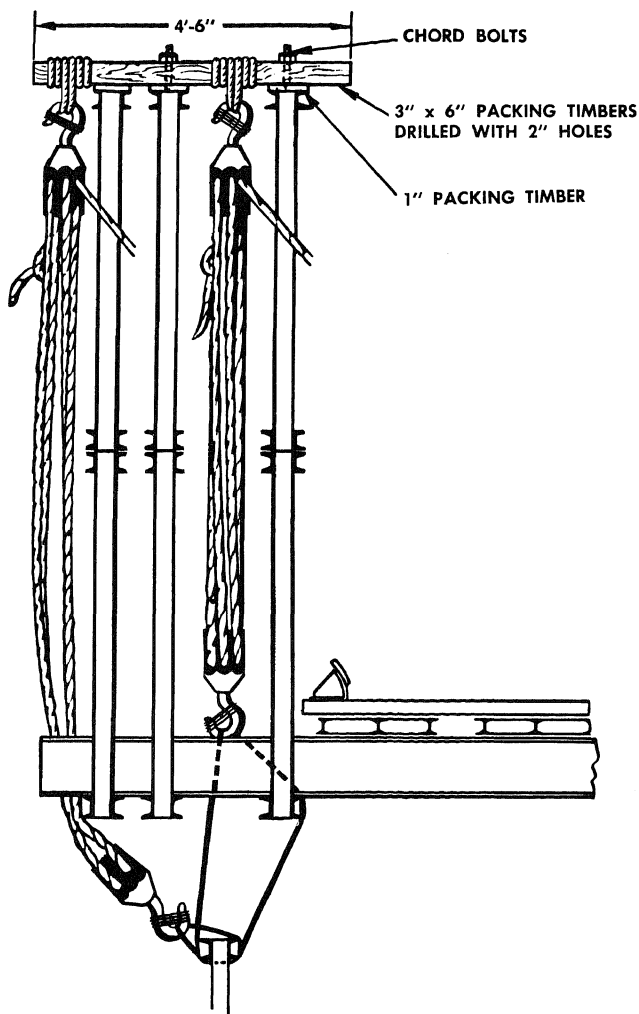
Positioning underslung single-truss girder using block and tackle.
